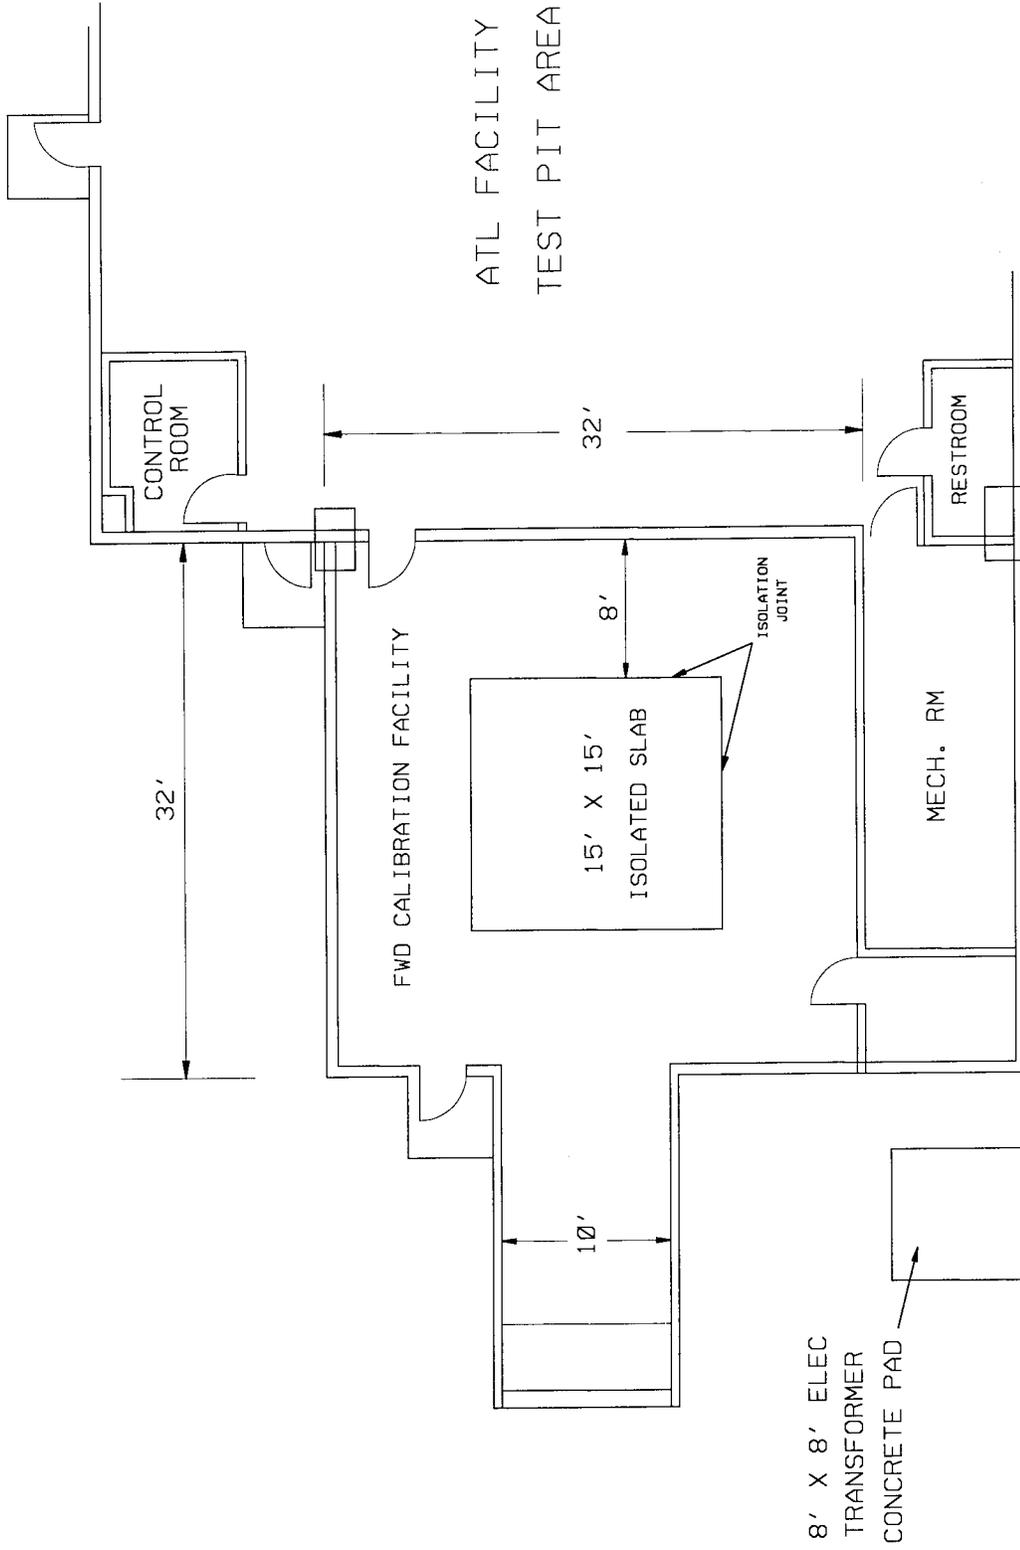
Floor Plan of FWD Calibration Facility and K-ATL
